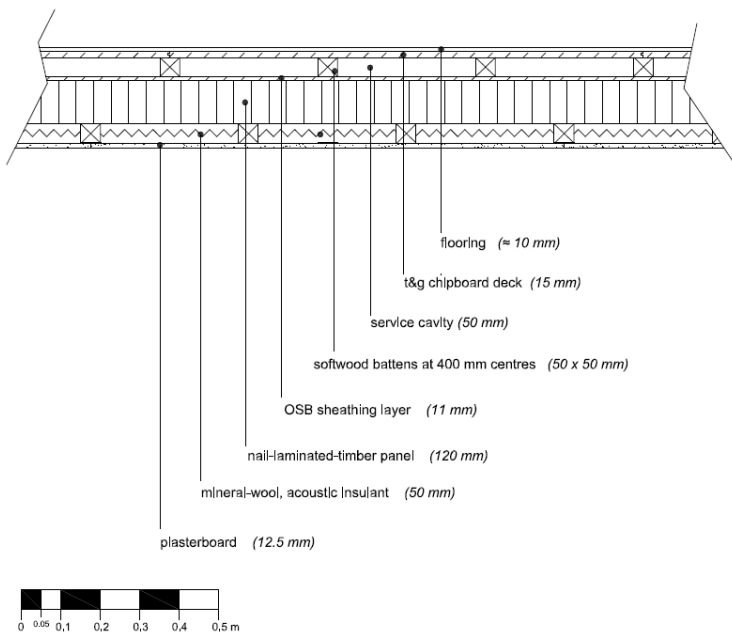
Intermediate floor E (nail-laminated timber), cross-section.
